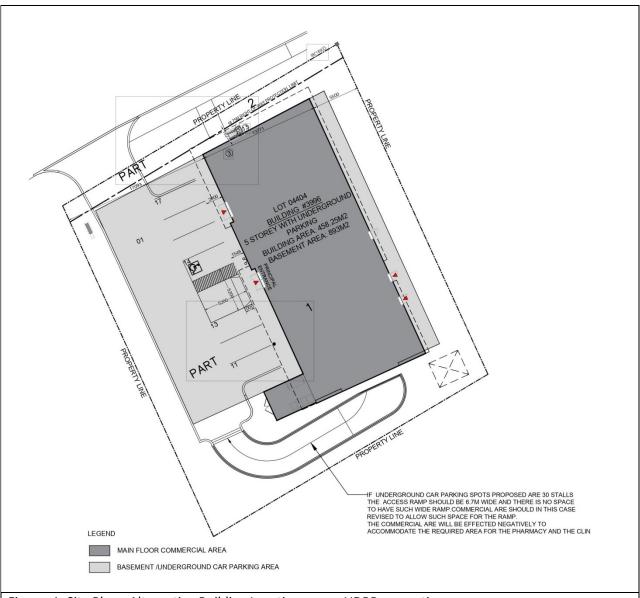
Site Plan - Alternative Building Location as per UDRP suggestion
